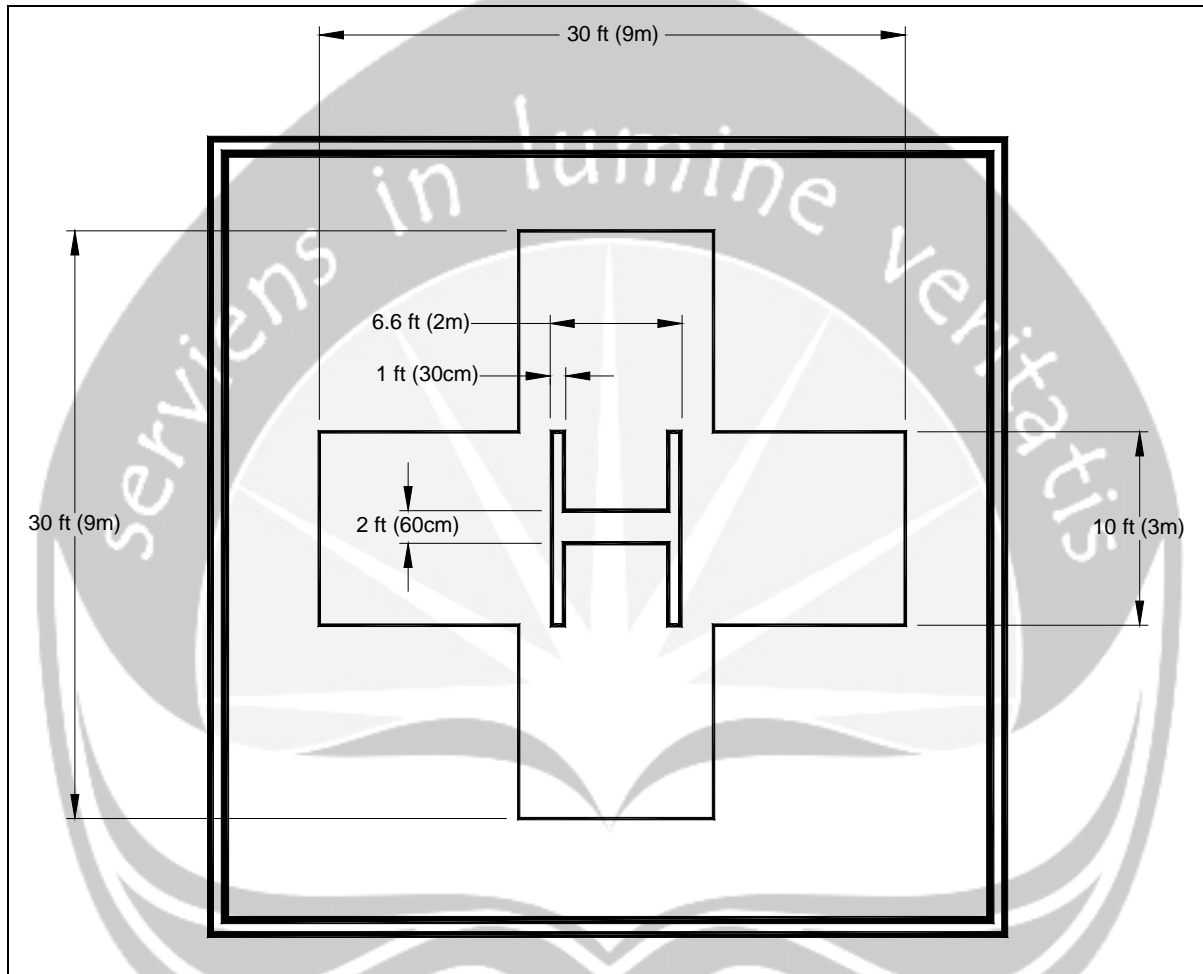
Paved TLOF/Unpaved FATO – Markings:
